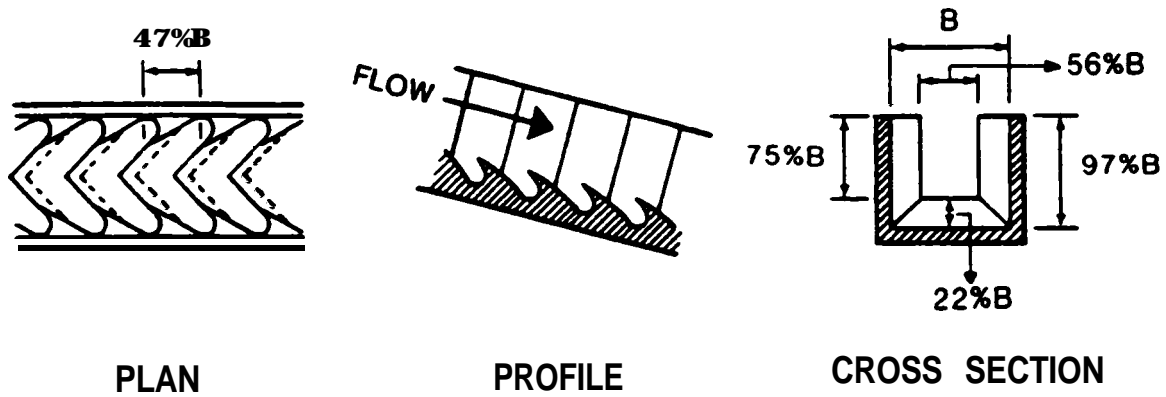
Denil's early fishpass with roughness elements on floor and walls.
